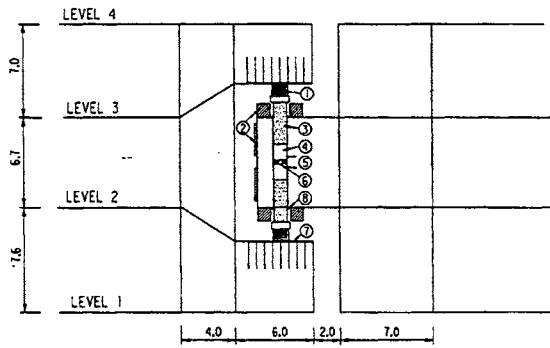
Vertical/ longitudinal section of Wing Connector.
